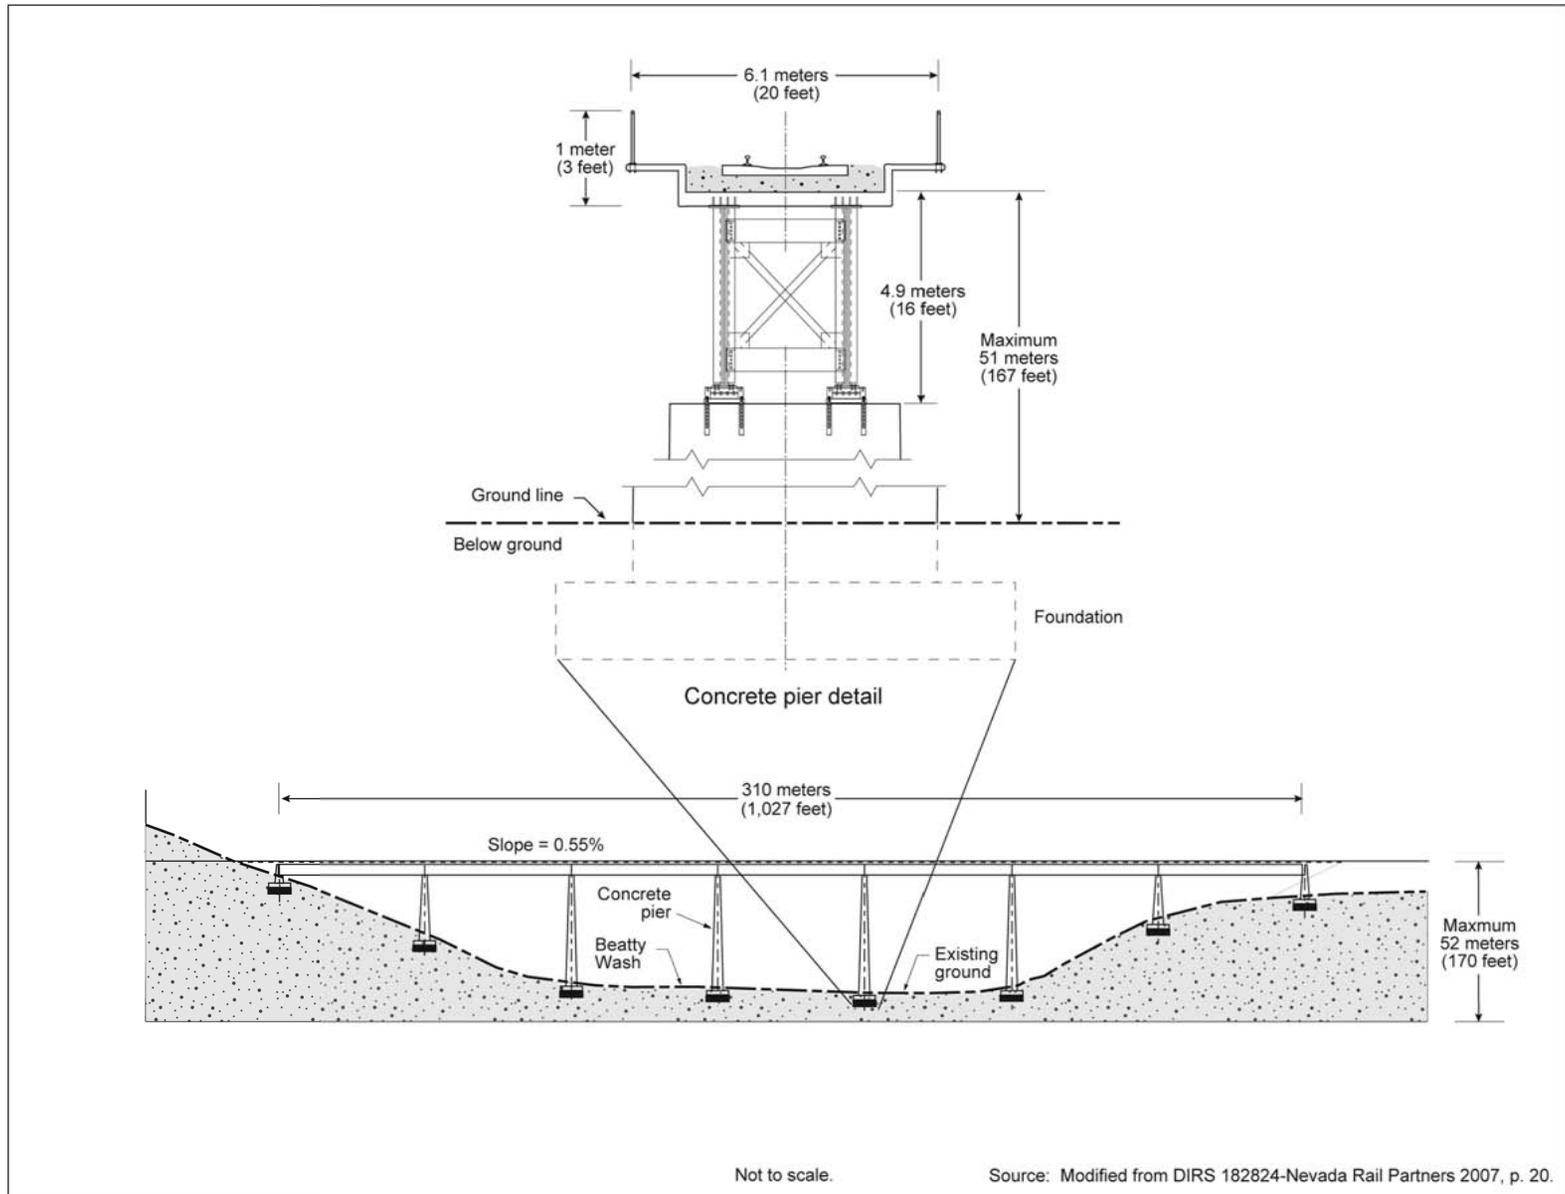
Cross-section of a planned bridge across Beatty Wash.
